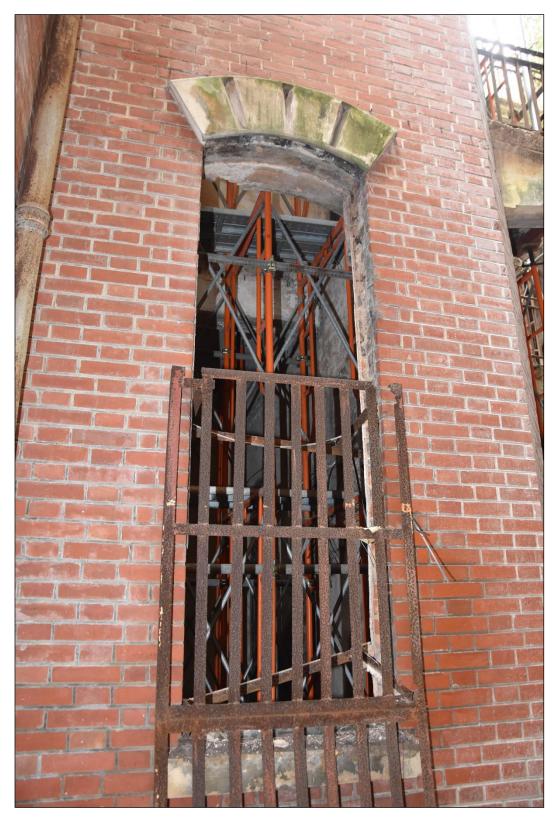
North-west elevation (facing Admiralty side), ground floor, window Wdw-Gf11, external side, (21st March, 2023)
